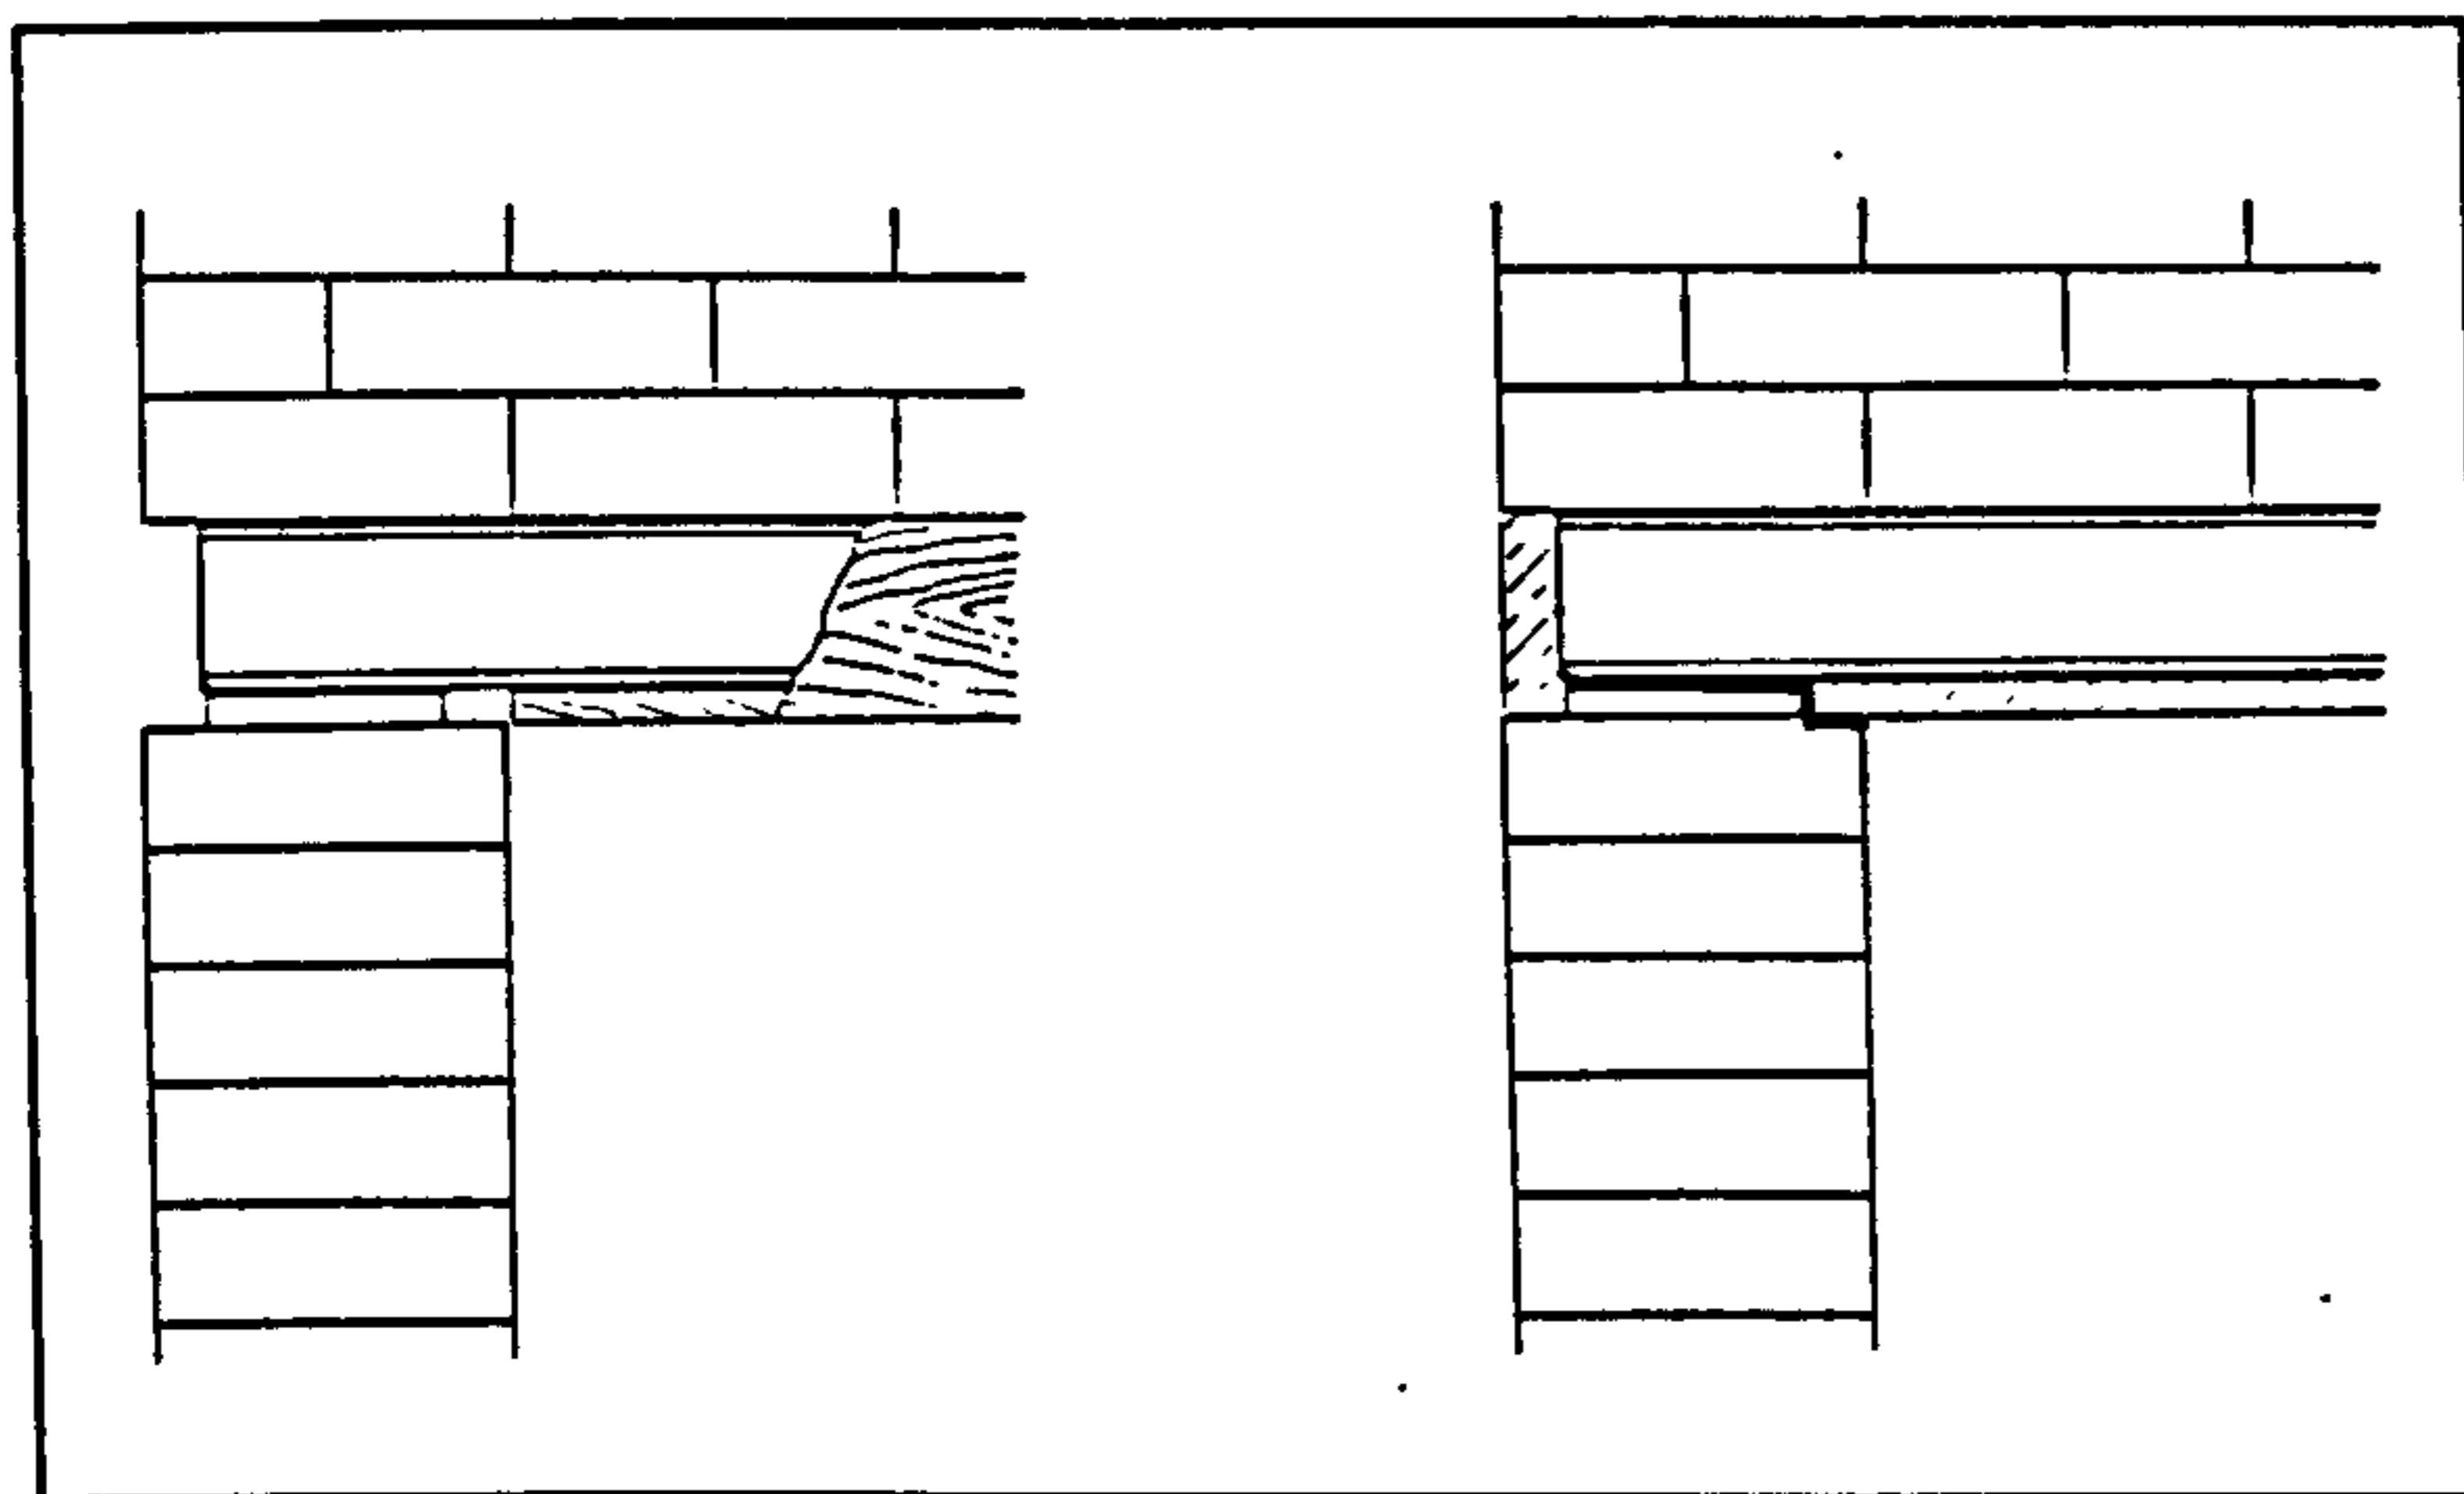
Lintel construction with iron I-beams. Cased with timber boards by Doll (a) and with concrete by de Jong (b). Blue line indicates where iron is not protected by concrete.
